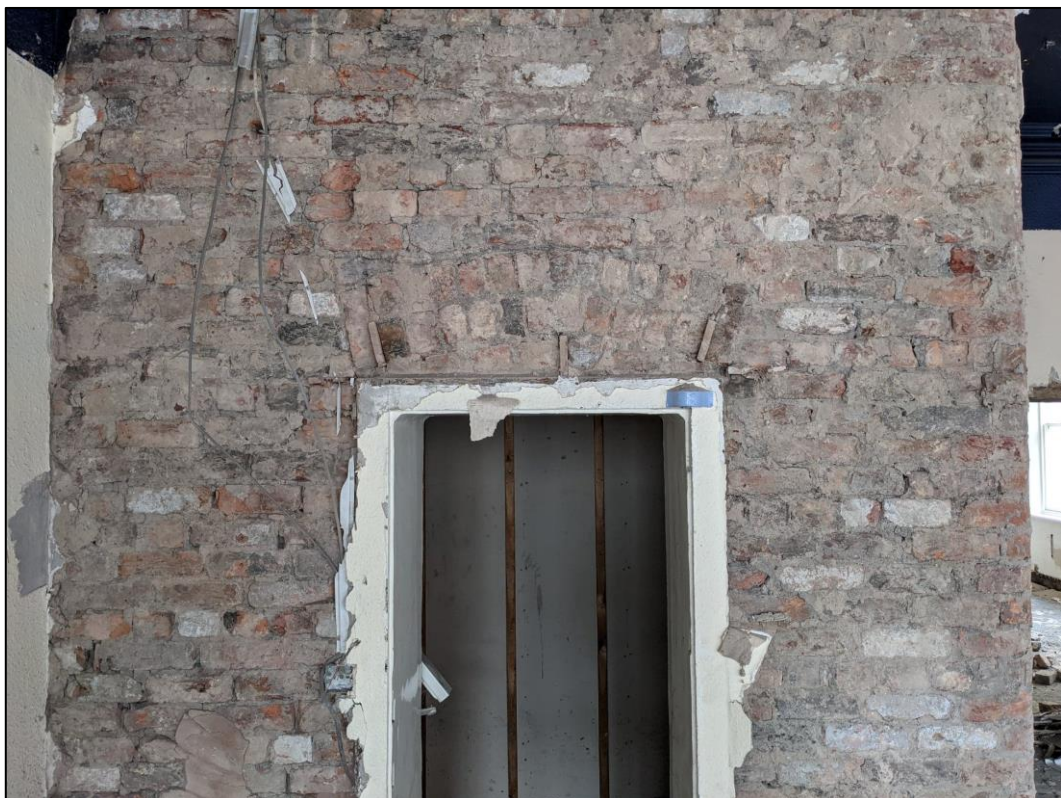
View of the segmental arch with brick voussoirs above the vault doorway in room SF2, taken facing north
